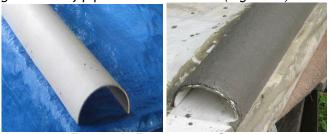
Ferrocement Gutting FERROCEMENT NON STRUCTURAL ELEMENTS FOR INTERNAL USE
